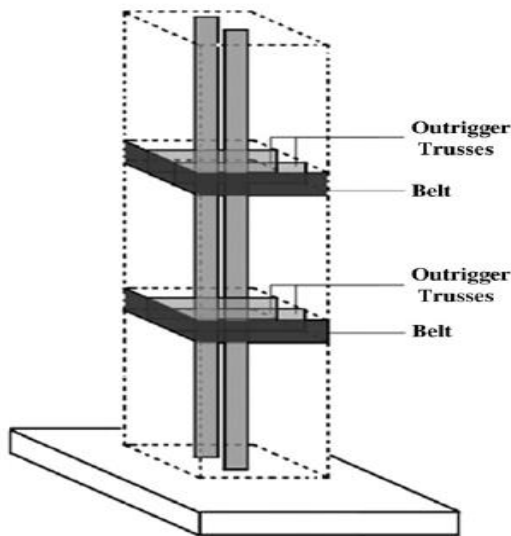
Structure with Outriggers and Outrigger with Belt Truss
